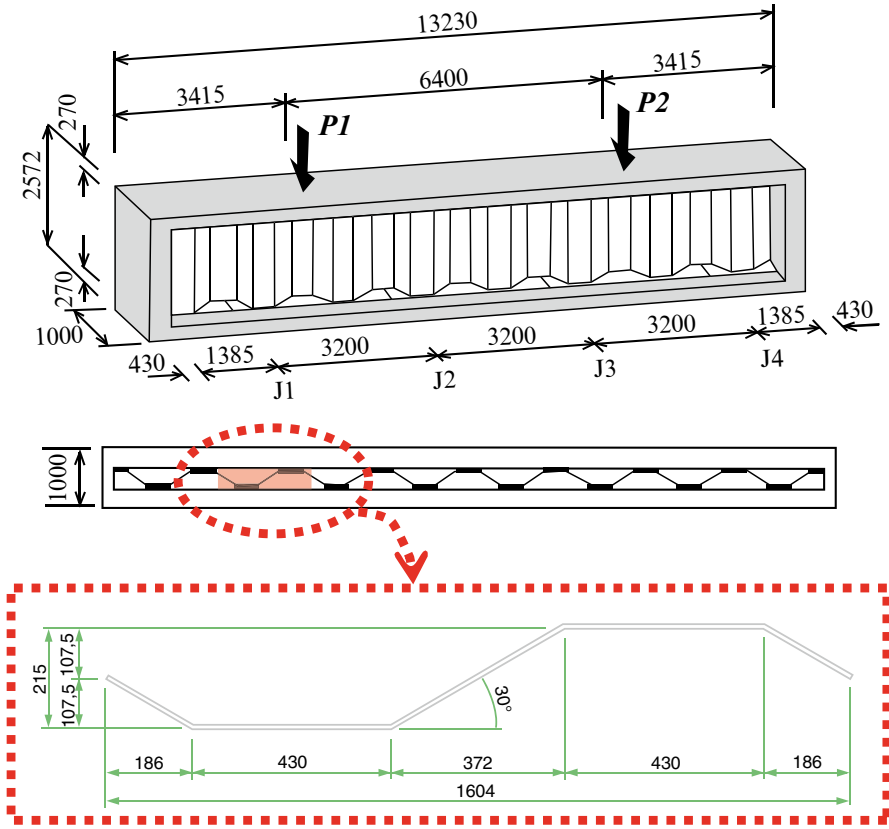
Ata et al. (2001) test specimen (dimensions in mm)
